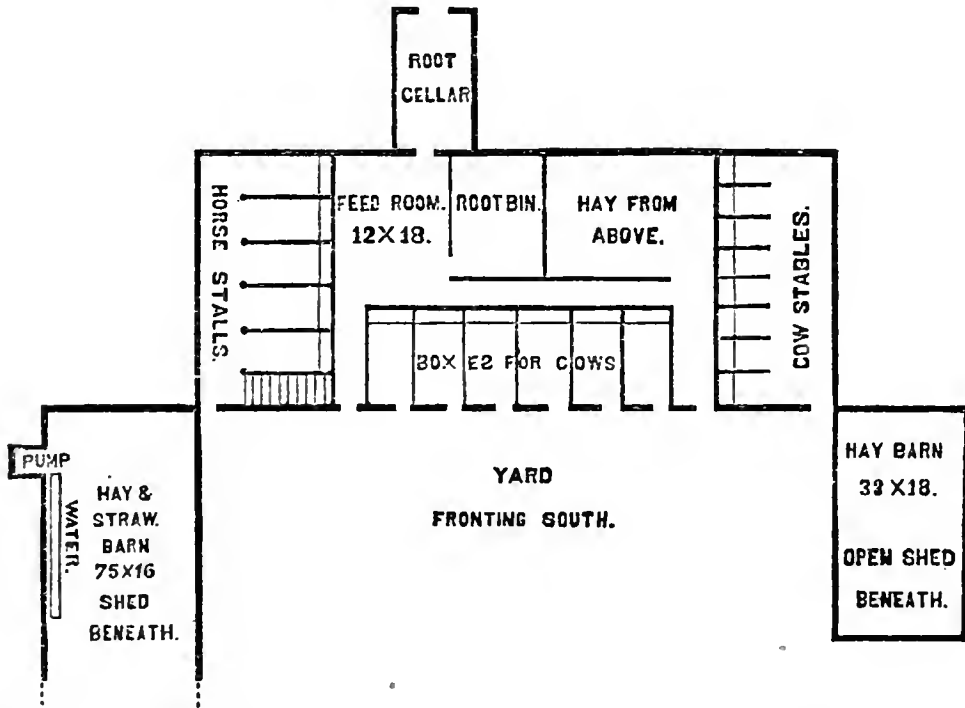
Basement and Stables—three sides with Stone Walls under ground.
